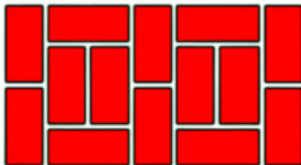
The order of laying bricks in the vertical constraint of the brick wall. Wall thickness 2 brick.
